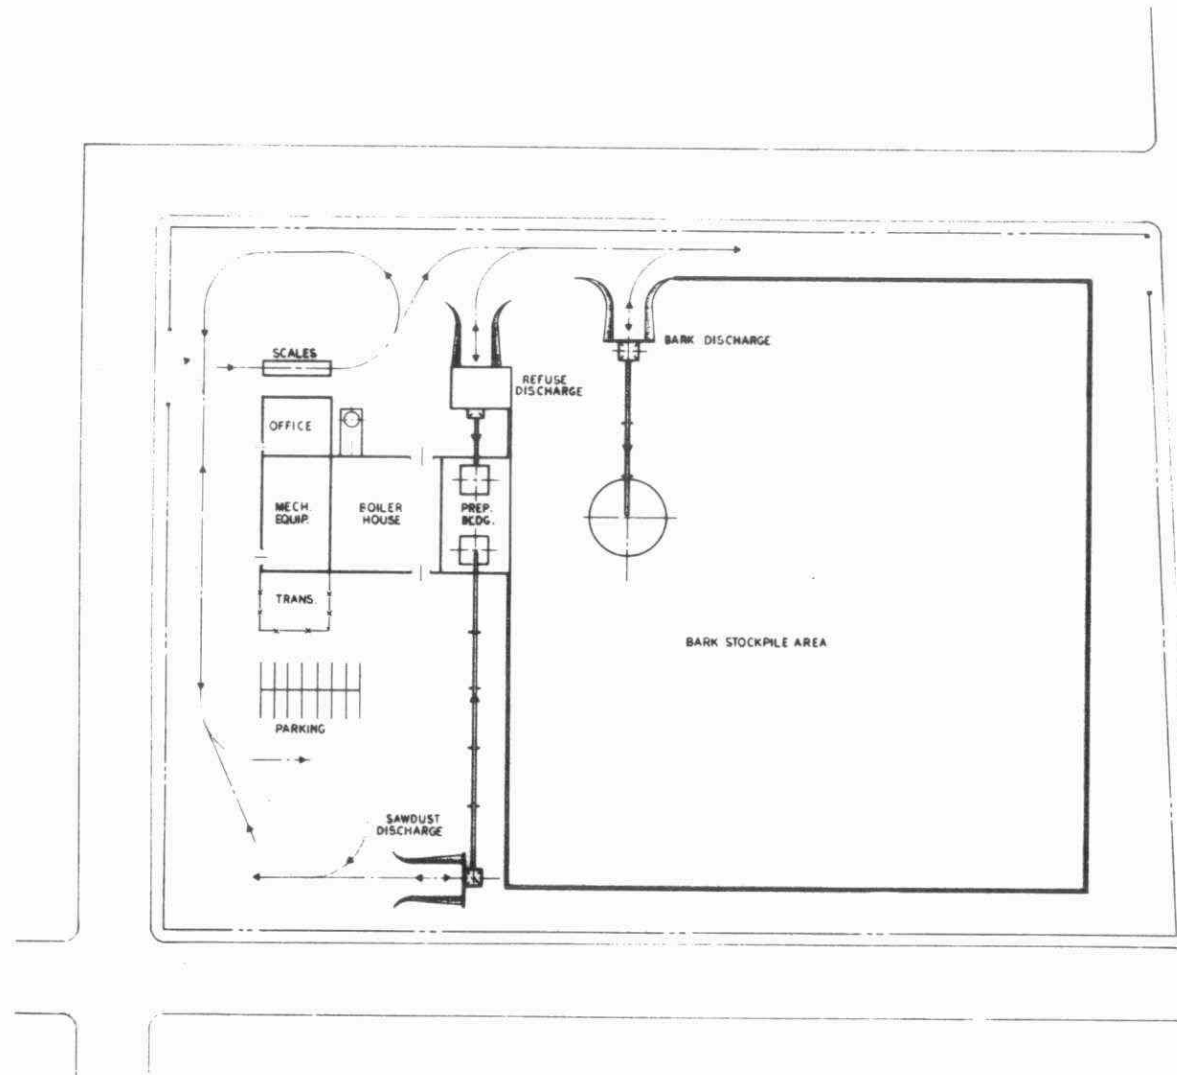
ENERGY CONVERSION FACILITY, TENTATIVE SITE PLAN
